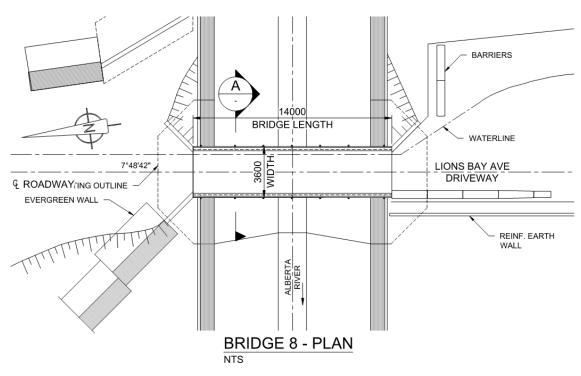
Lions Bay Avenue Bridge over Alberta Creek (Driveway) – Plan
